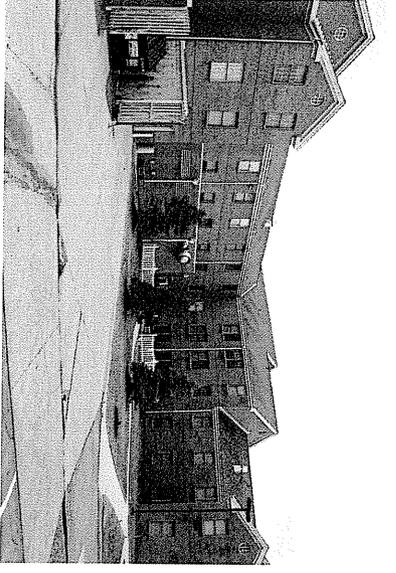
LOCATION OF NEW COMMON SPACED/MECHANICAL ADDITION
